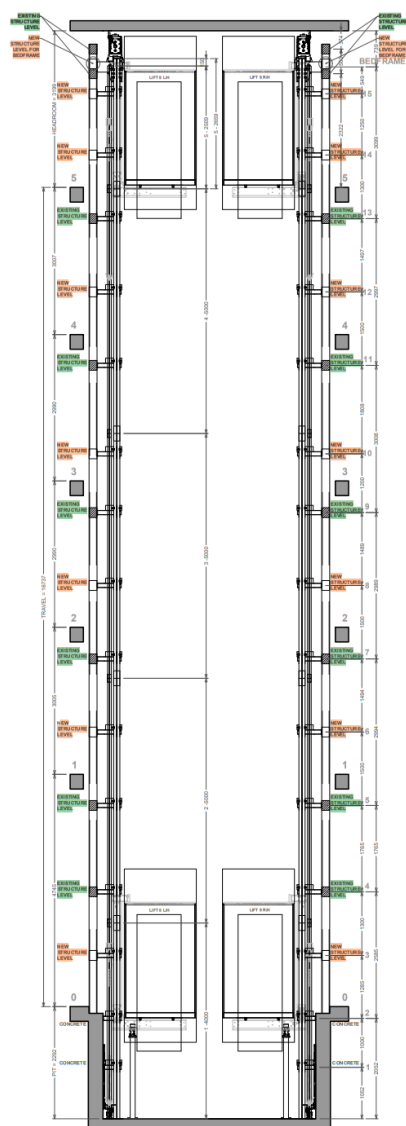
(left) Elevation Showing existing steelwork and proposed intended steelwork.
